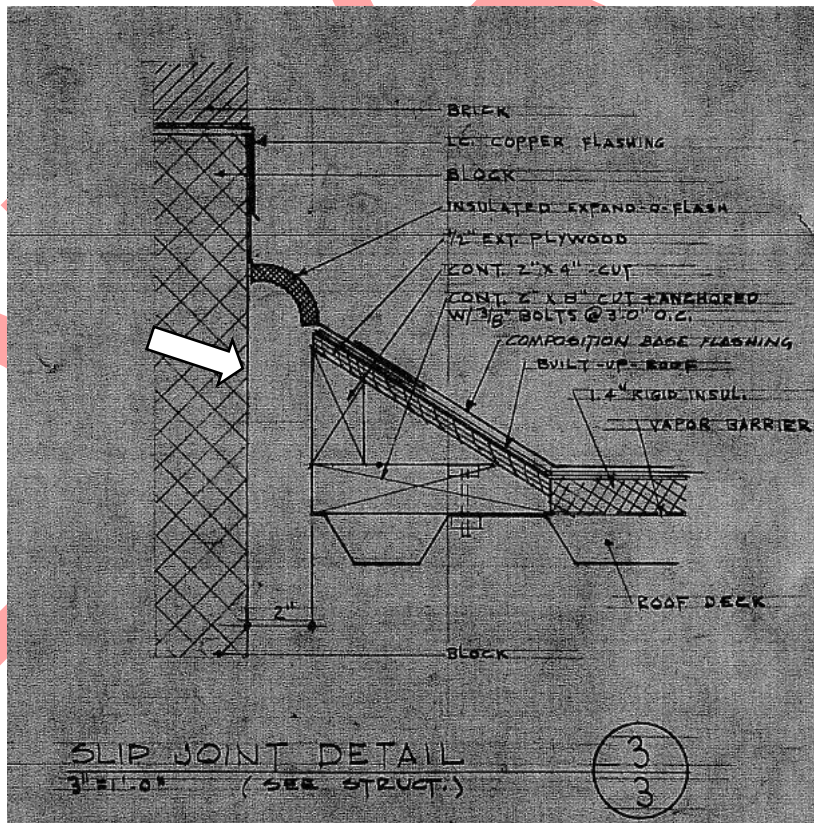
Typical slip/expansion joint detail. Taken from Detail 3/3 of the 1968 Drawings. Potential open interstitial space indicated by arrow.
